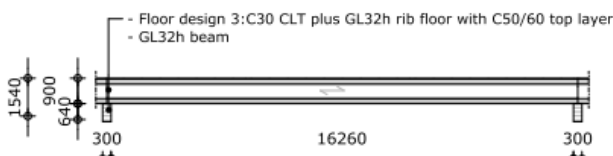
Cross-section C-C glulam beam in mm maximum height
